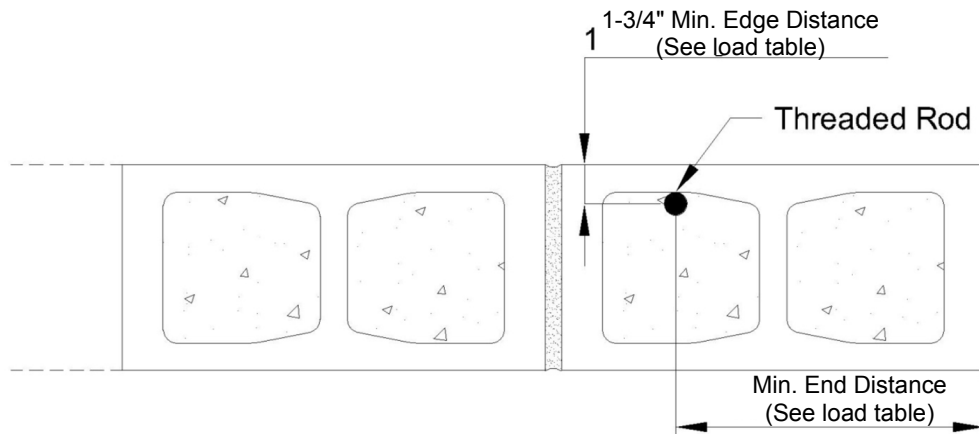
EDGE AND END DISTANCES FOR THREADED RODS INSTALLED IN THE TOP OF GROUT-FILLED CONCRETE MASONRY
